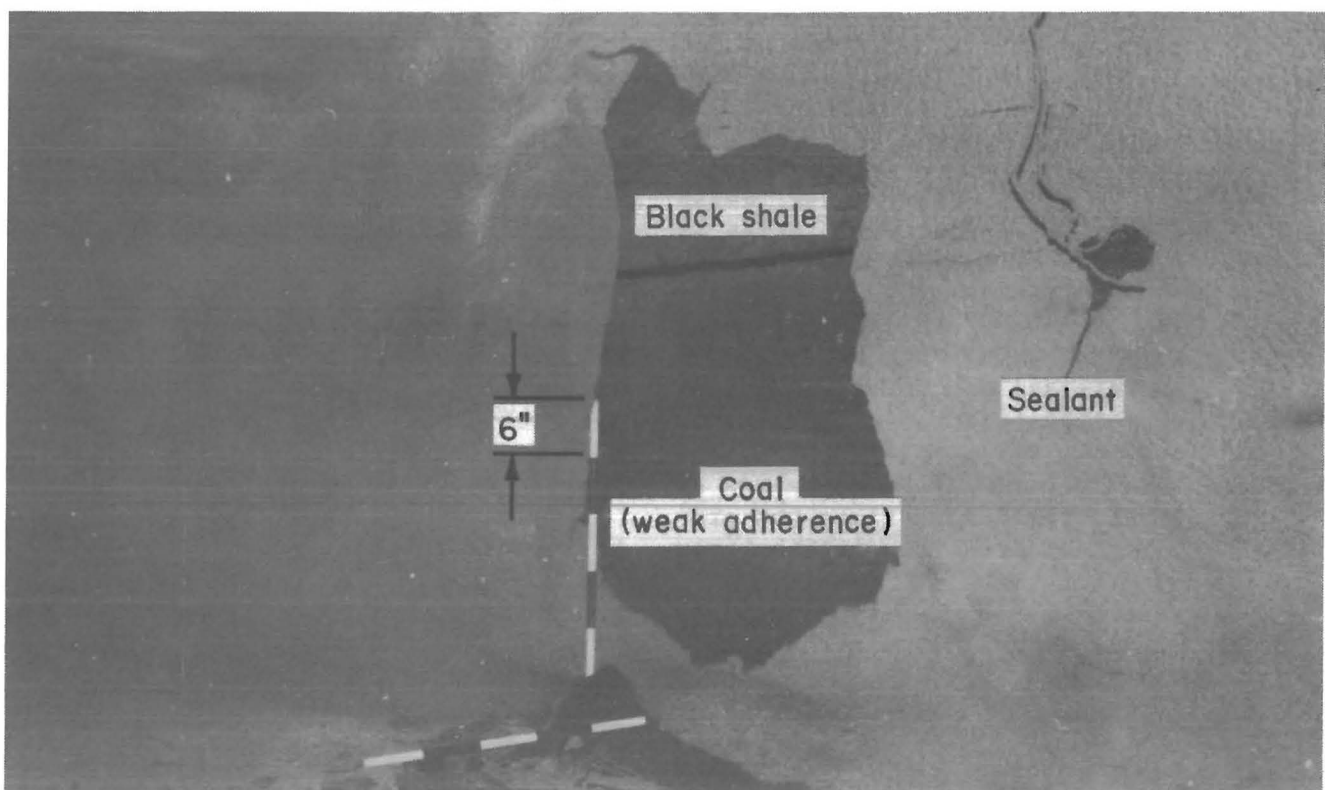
Area of 3 South under black shale roof sealed with Mandoseal, illustrating some spalling effects along the coal rib.
